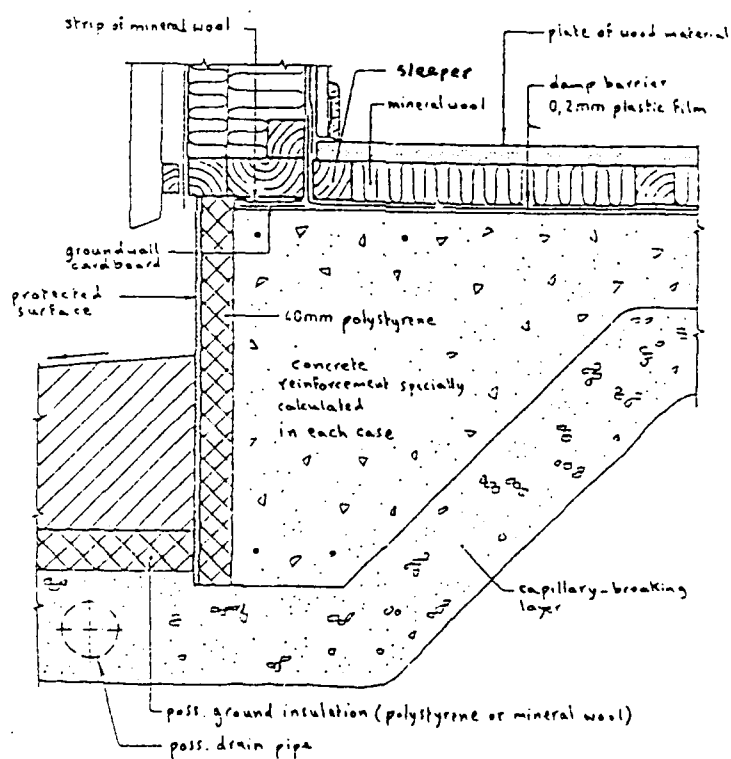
Wood surfaced floor with edge-expanded concrete slab
